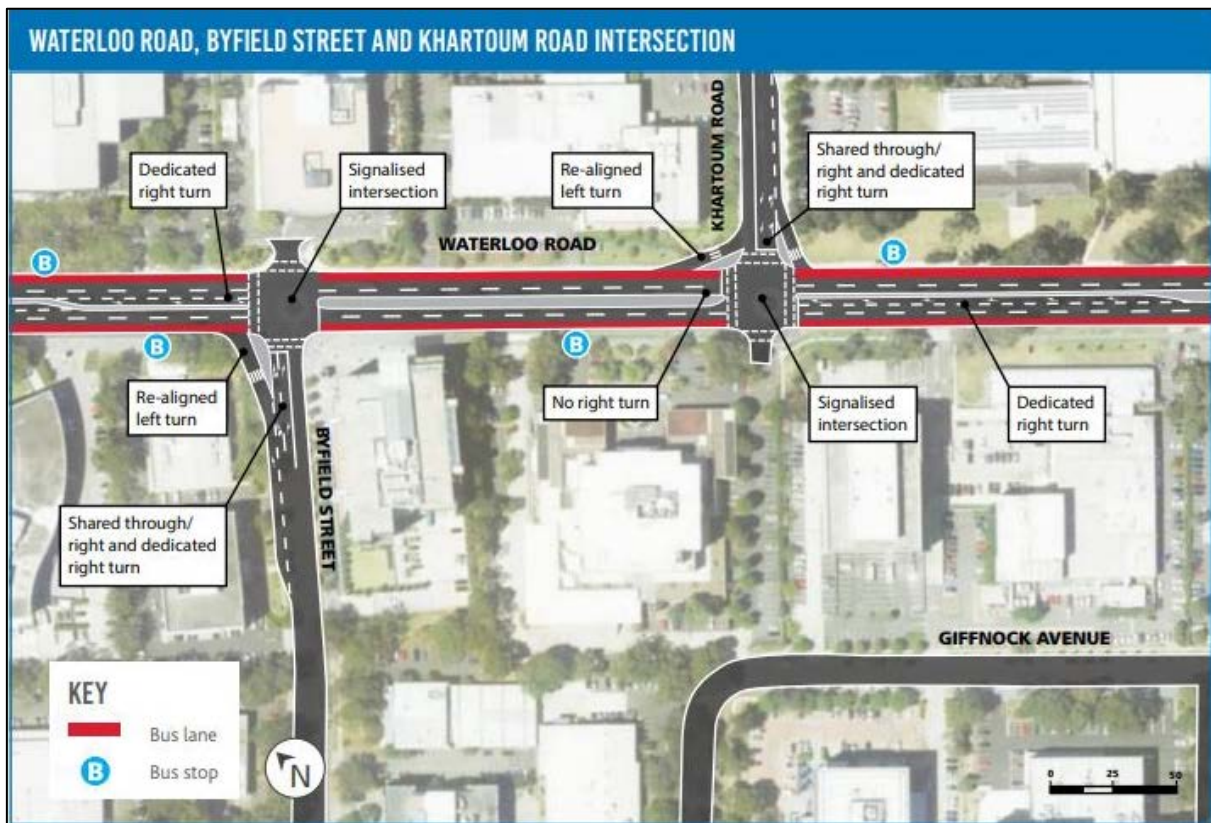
Proposed Upgrades to Waterloo Road & Khartoum Road Intersection
